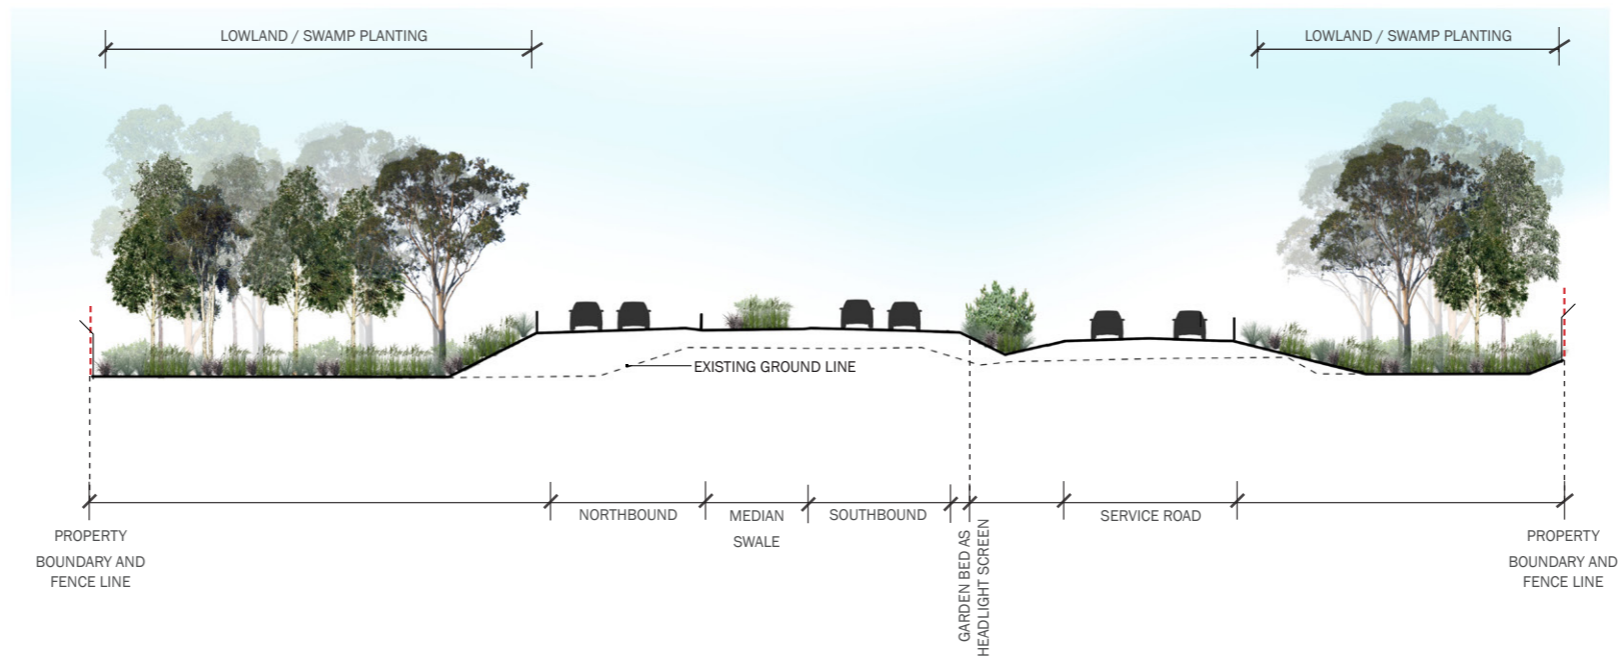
Cross section G-G in Pimlico (Scale 1:400) Note: Fence locations and types are to be confirmed, and subject to further design development
